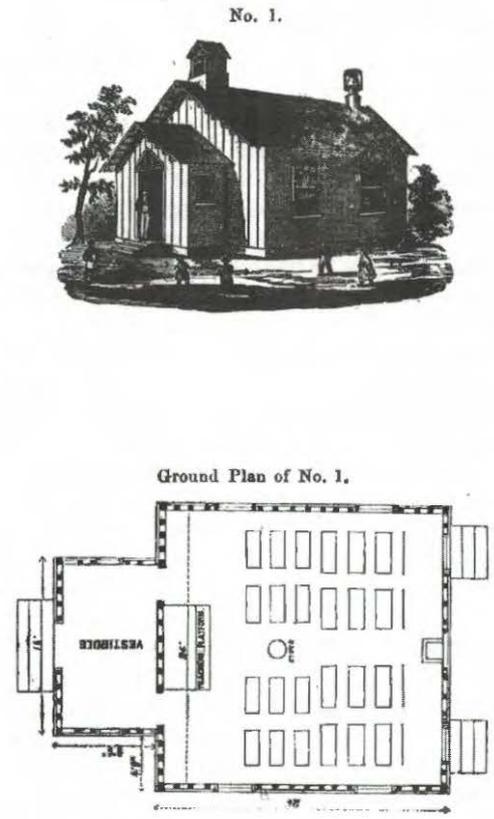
Van Bokkelen’s 1865 plan and elevation for Schoolhouse No. 1.
